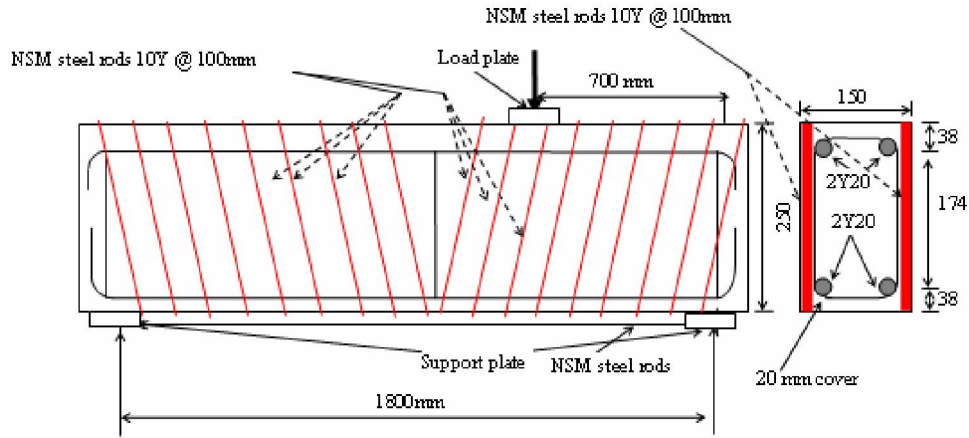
Loading arrangement of test beam with NSM steel rods (B2-SR)
